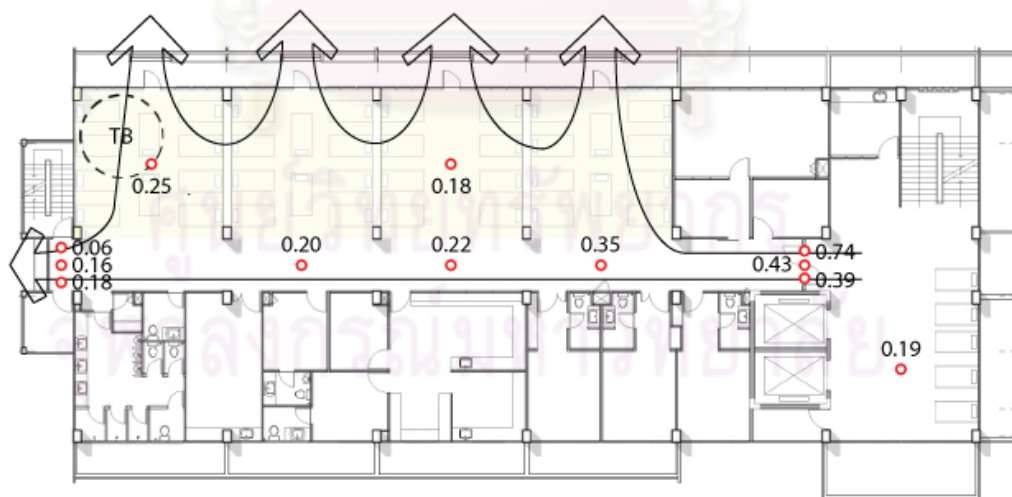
Floor plan and ventilation data of hospital B inpatient ward
